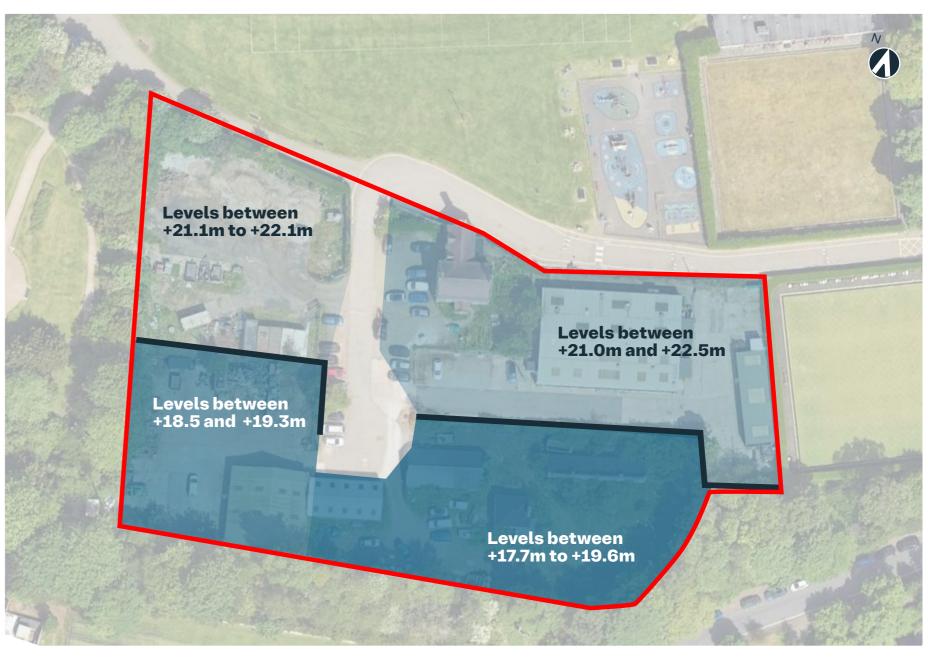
| Diagram illustrating existing site levels and retaining wall features
